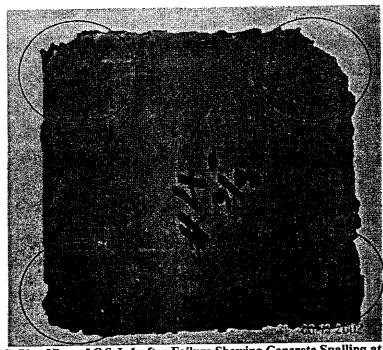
Plan View of C-S-L-1 after Failure Showing Concrete Spalling at Corners
